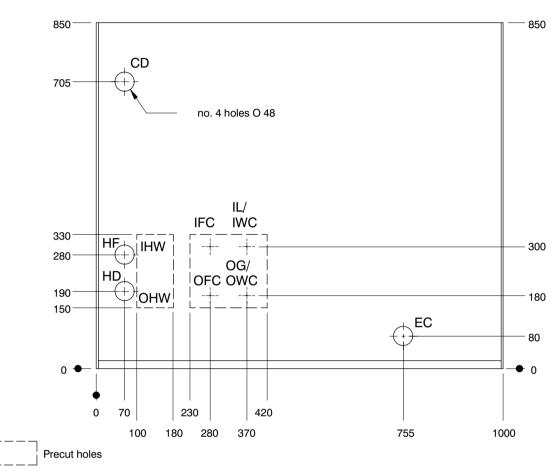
Refrigerant, water and electrical connections Liebert HPM D1E..D2E, plan view
